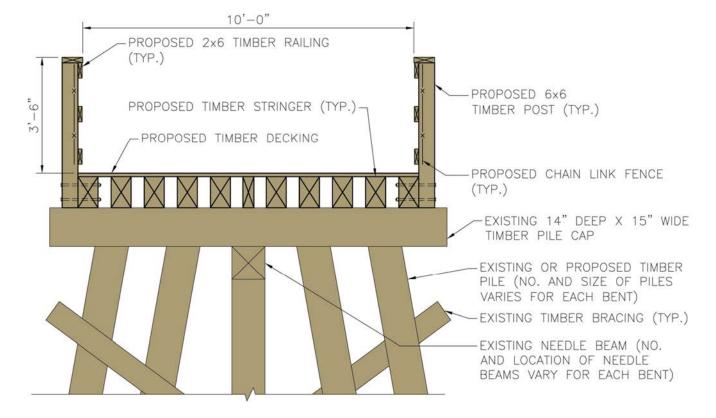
Alternative 1 – Rehabilitation of Existing Bridge Structure Cross Section
